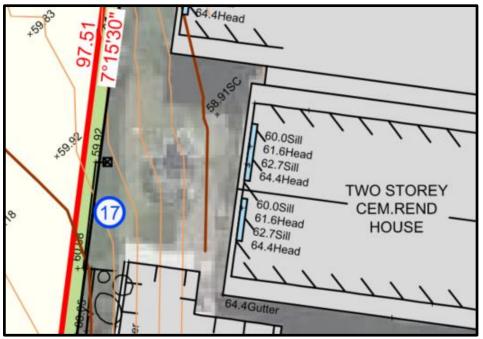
31 Barnsbury Road Group 3 First Floor Windows
